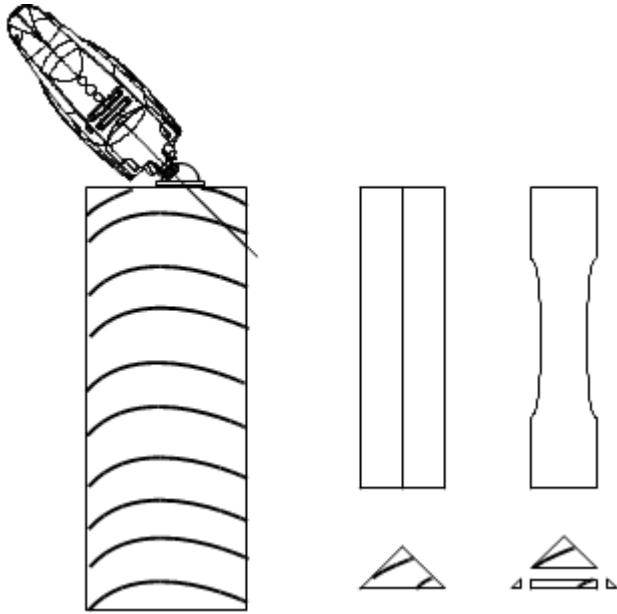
Method of extraction of the mesospecimen, from left to right: cut of the face-edge corner with a jigsaw, the obtained triangular prism specimen and final arrangements to reach the desired shape
